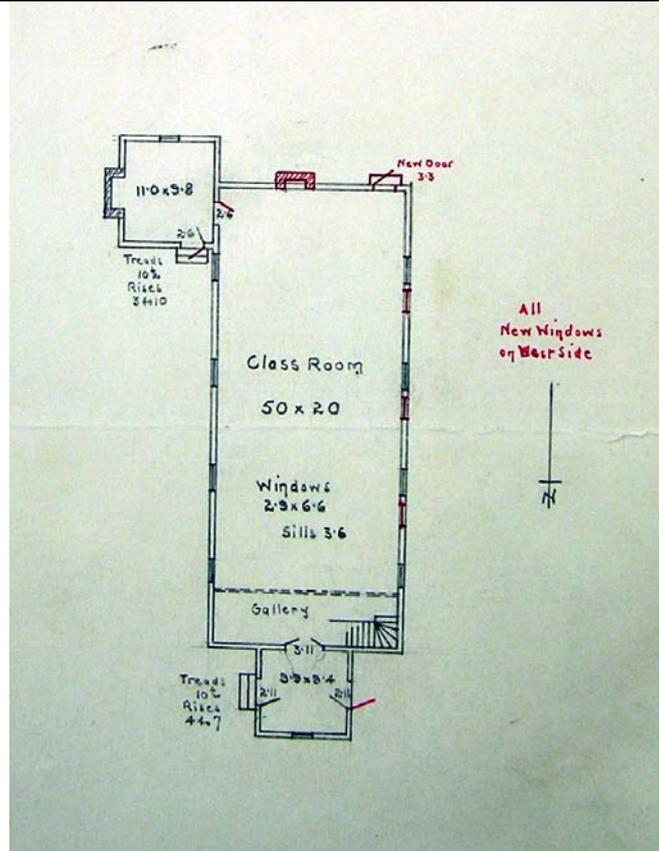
Floor Plan of St. Brigid's Catholic School, n.d. [c.1914]
